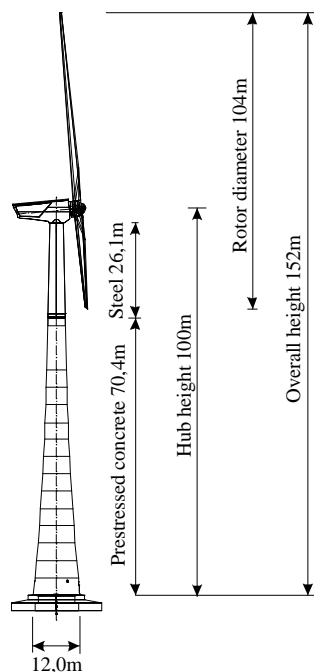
Hybrid tower for GEWE 3.6 prototype
